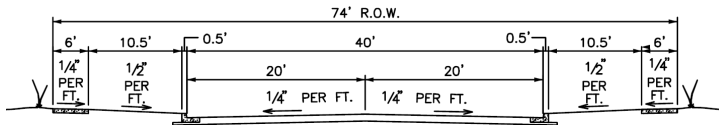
TYPICAL STREET CROSS-SECTIONS
